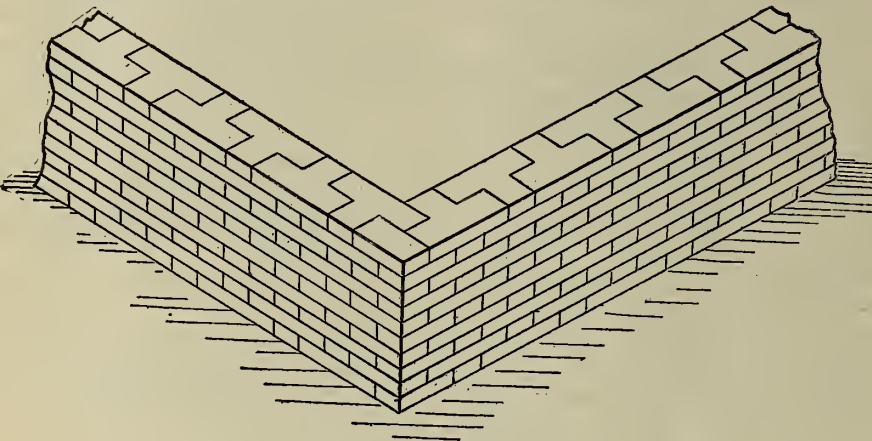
CHECKER FACE, 9-IN. WALL, COMMON BRICK USED ON CORNERS.
